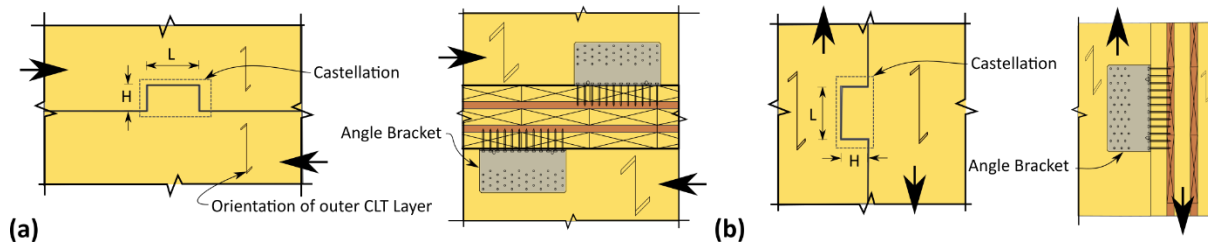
Castellated and angle bracket joint configuration for (a) perpendicular to the outer CLT face loading, and (b) parallel to the outer CLT face loading.
